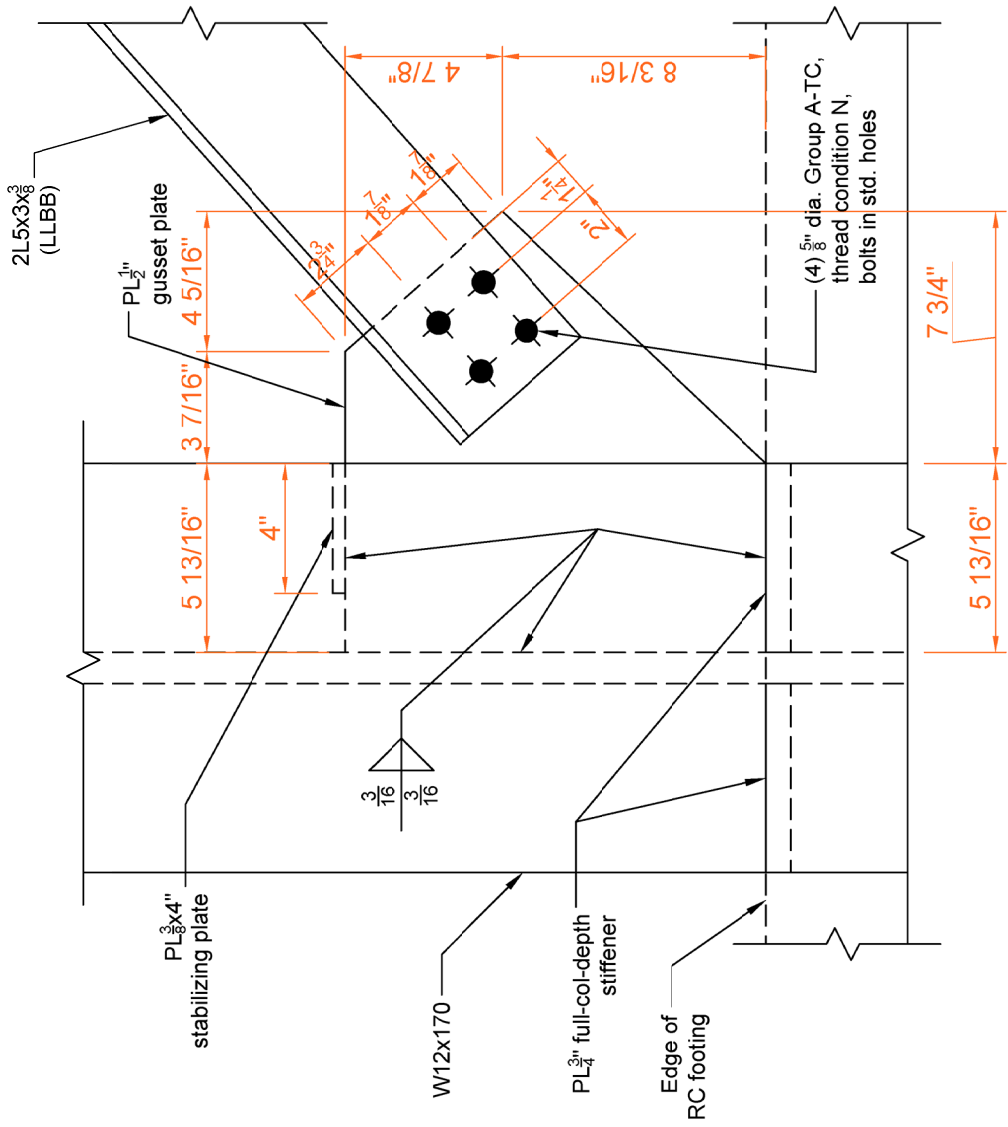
Bottom Gusset Plate Connection in Frame 1 (DWG S14)
